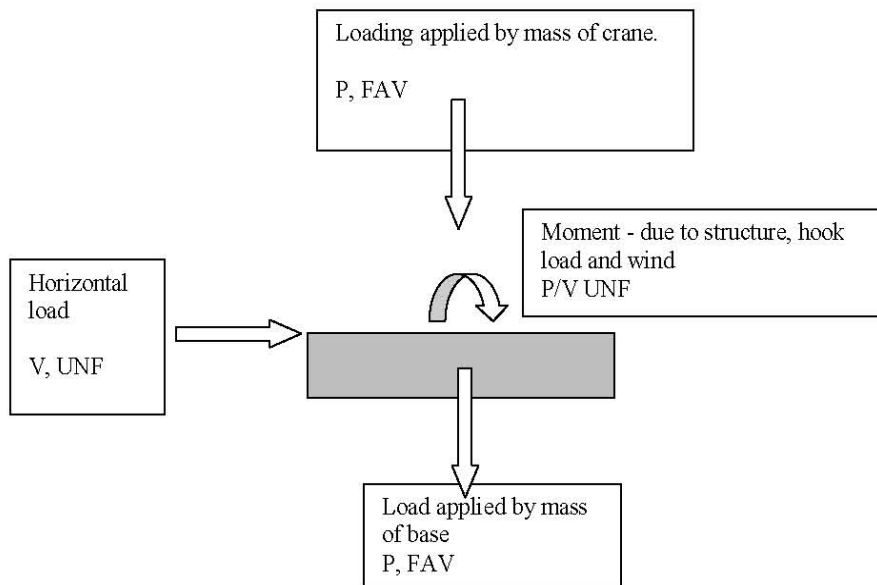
Loading applied to base by tower crane on cast-in anchors
